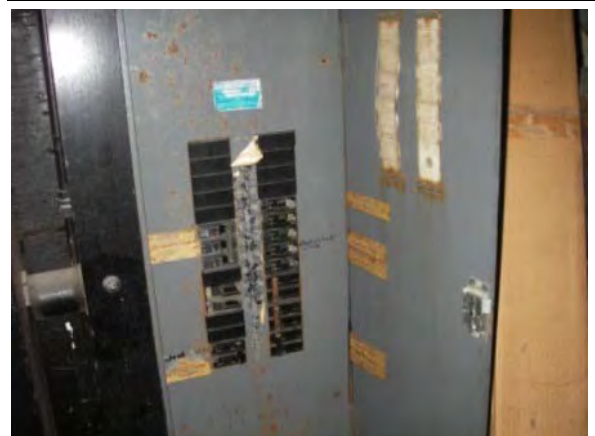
1952 WING BOILER ROOM OLDER ELECTRICAL PANEL
